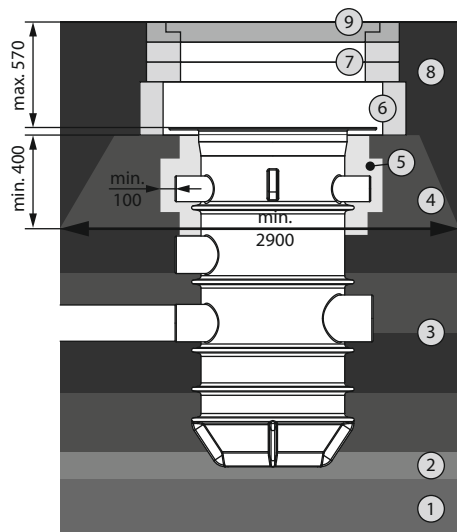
Pit filling (with D400 pump chamber cover installed)
